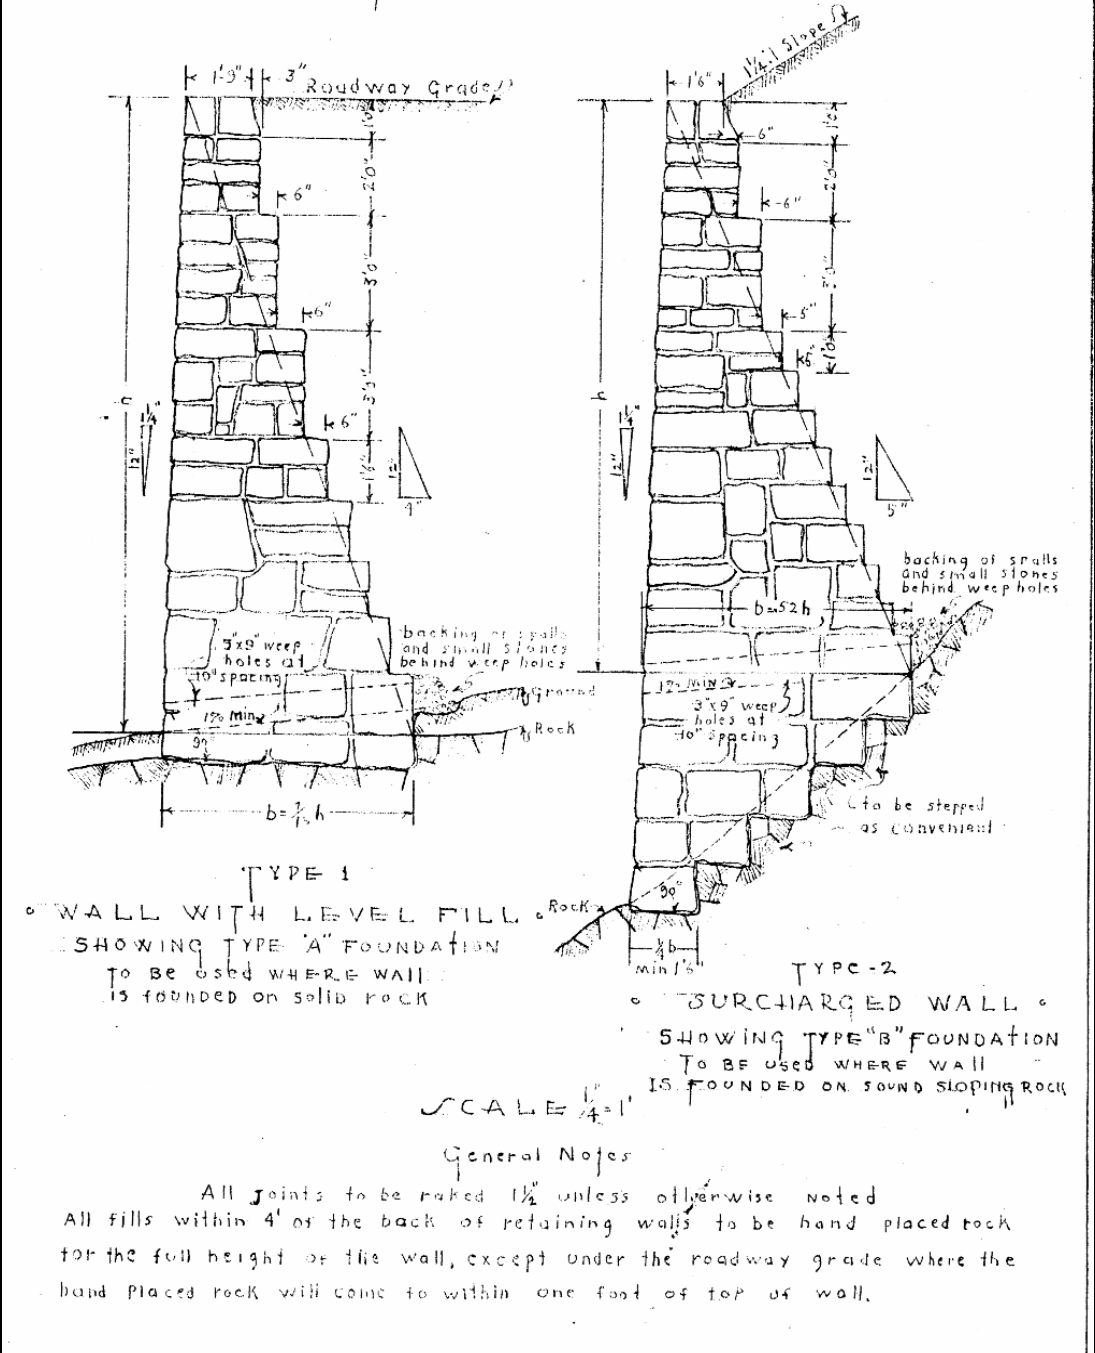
"Types of Retaining Walls," (General Construction Notes, 1935).
